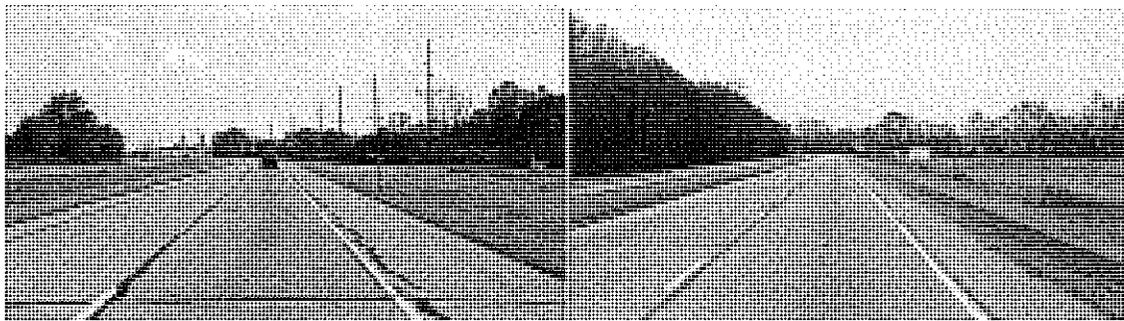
Sealing Reflection Cracks in Composite Pavements
